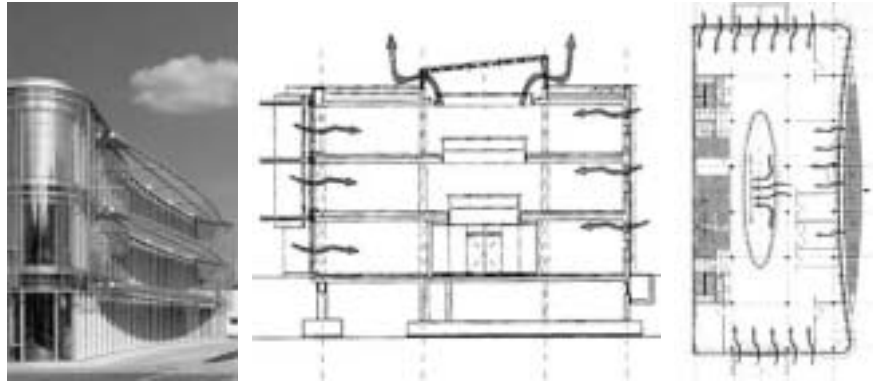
The south façade of the DaimlerChrysler Aerospace building has a distinctive concave shape with fixed solar shading devices integrated (*left*). Drawing of the section (*middle*) and drawing of the plan (*right*).
